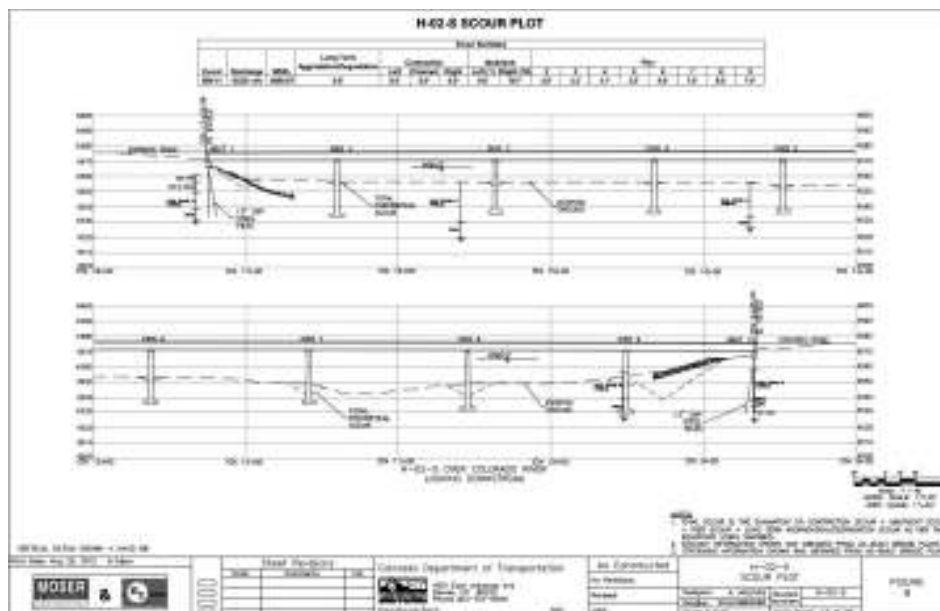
Scour plot generated in AutoCAD showing bridge geometry, foundation elevations, sediment boring hole results and theoretical scour
